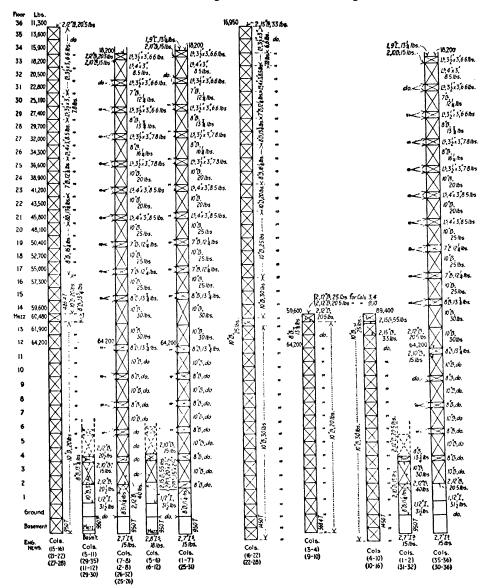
DIAGRAM OF WIND BRACING, SINGER BUILDING.
